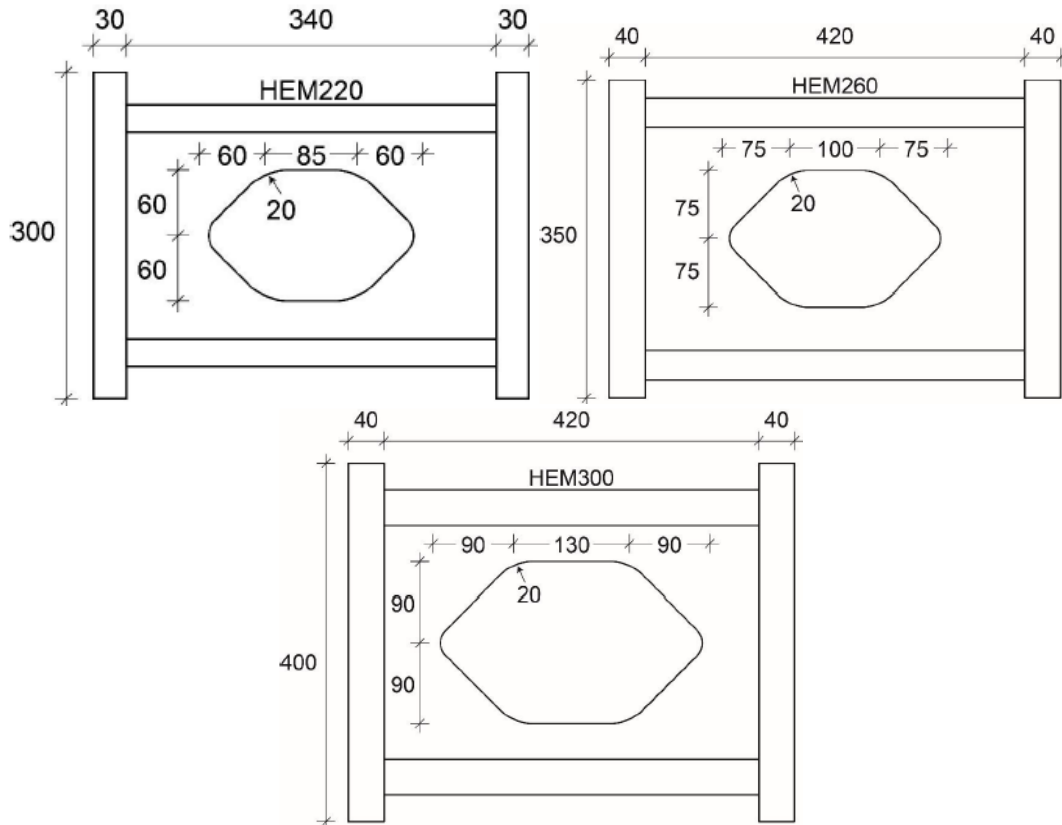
Side view of the steel stub for the a) corner 30*30 cm² columns, b) edge 35*35 cm² columns and c) interior 40*40 cm² columns (drawing rotated 90°, units in mm).
